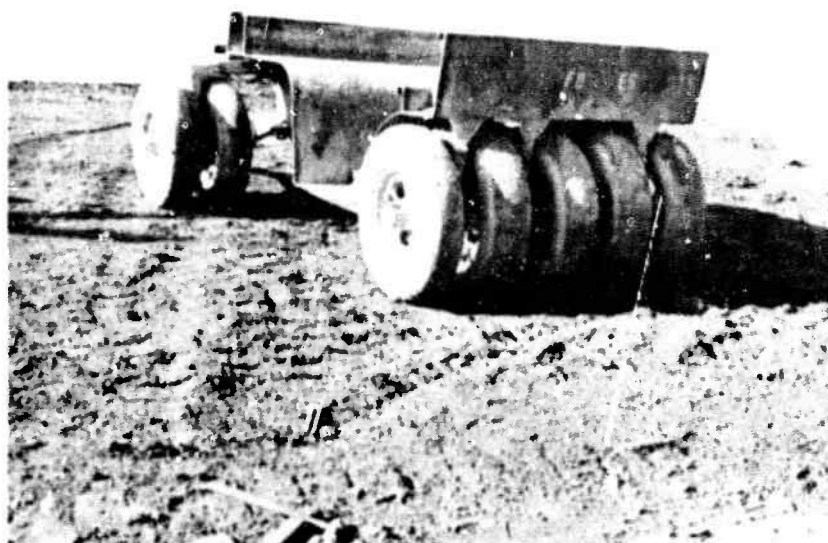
ROLLER BODY WITH SMALL SECTION REMOVED
